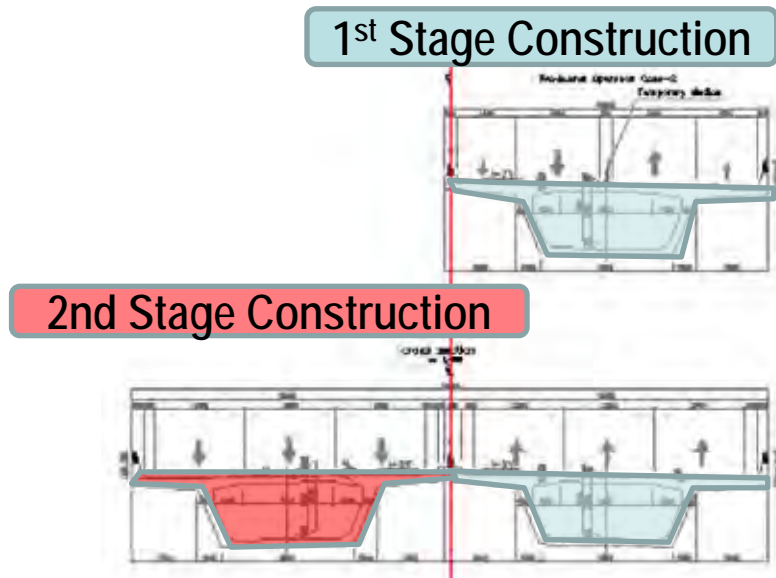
and 2.2-5 show the typical cross sections for stage construction of the bridges, which are described in Section 2.4.3.
